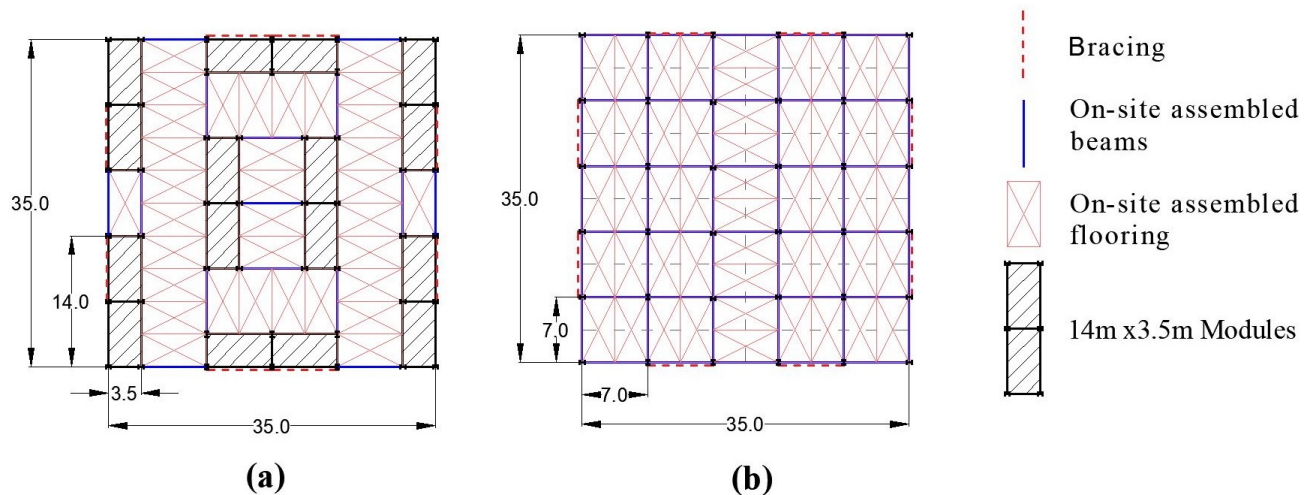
Plan view of the six-storey office building constructed using a) proposed structural modular system; b) conventional structural system (dimensions in m)
